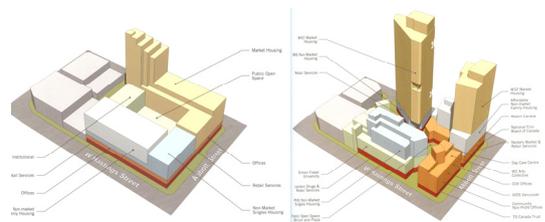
Original Plan and Final Plan using Transferred Heritage Density in Woodward's Project (Body Heat: The Story of the Woodward's Redevelopment)
